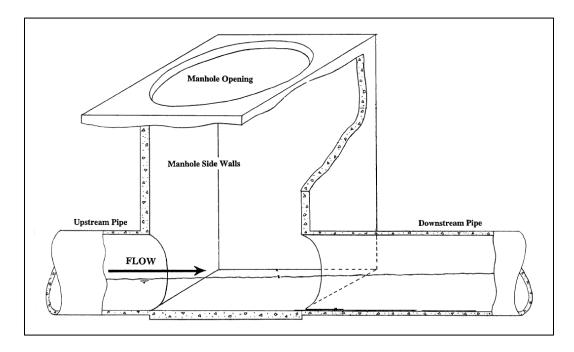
Illustration of Manhole at Stormwater Pipe Connection (Adapted from Maheepala, et al. 1998)
